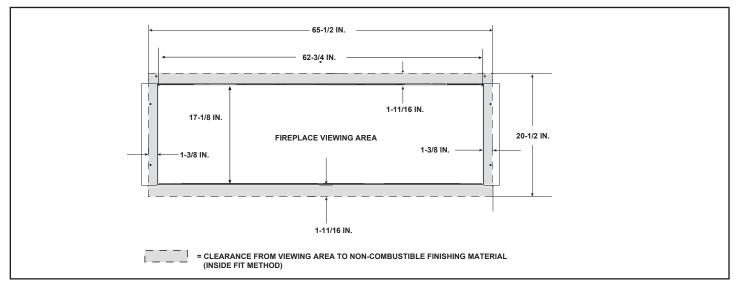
Noncombustible Surface Finishing Material 0-4 Inches Thick-Inside Fit Method
